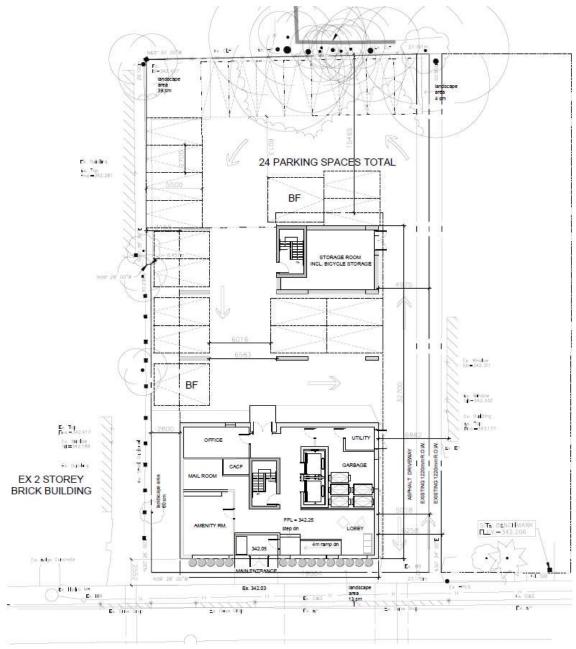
Proposed Site Plan. (Source: +VH Architects, The Ventin Group Ltd., 2021)
